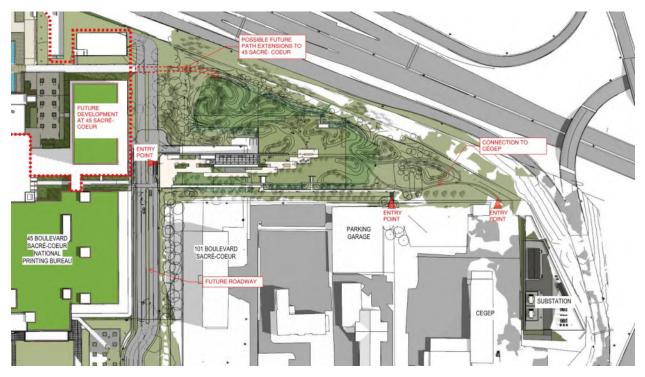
Context Plan showing future connections to 45 Sacré-Coeur and Cégep
